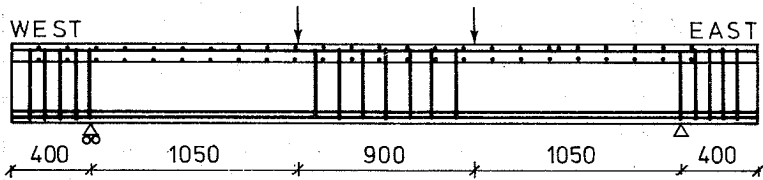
Elevation of test beam. Variable shear reinforcement not shown.
